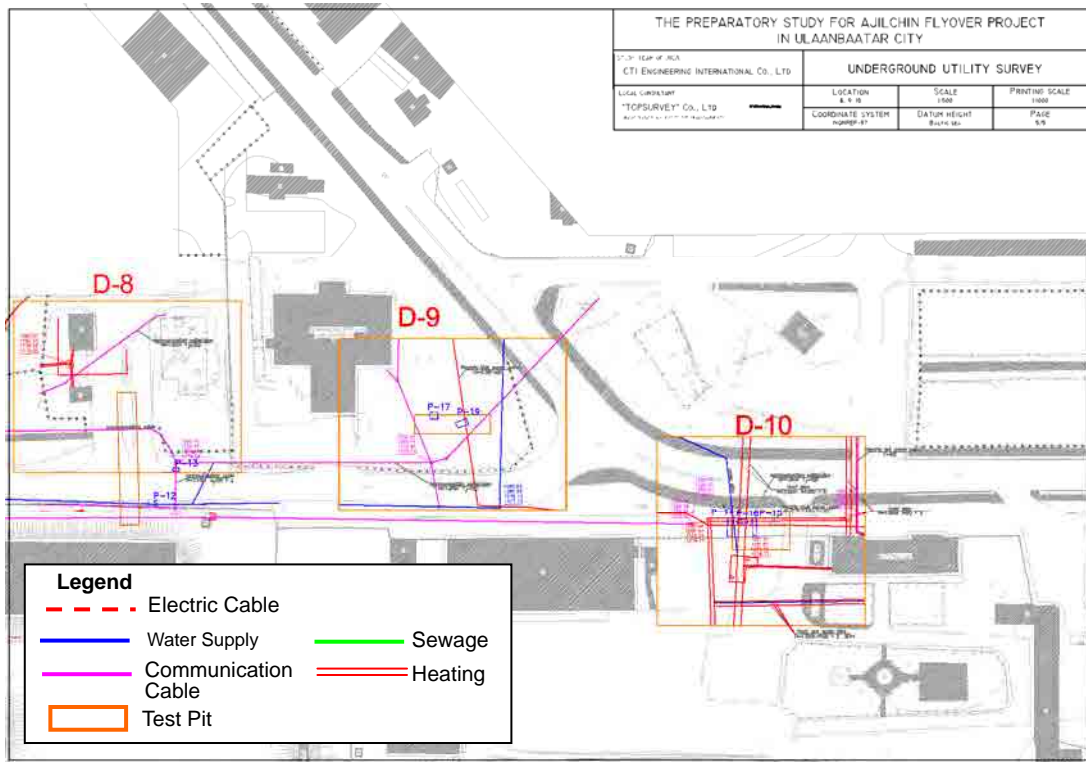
(5) Detailed Figure of Test Trench Location (D-8 to D-10)
